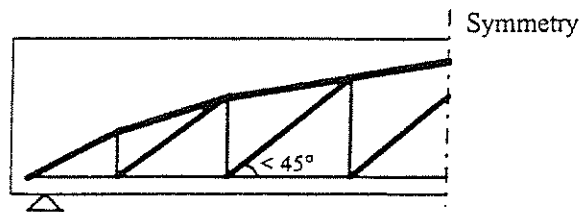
Modified truss action in a simply supported reinforced concrete beam by Leonhardt.
